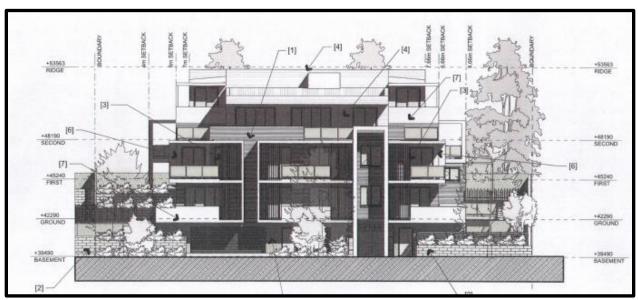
Font (north) elevation of the approved building at 9-11 Peake Parade (DA2013/0406)
